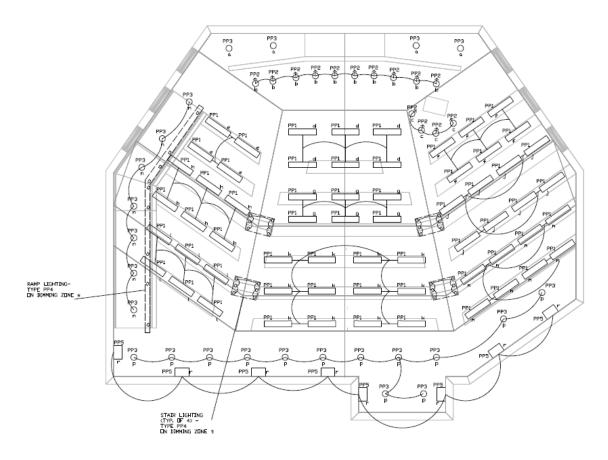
First Floor Circuiting Plan – Lecture Hall
